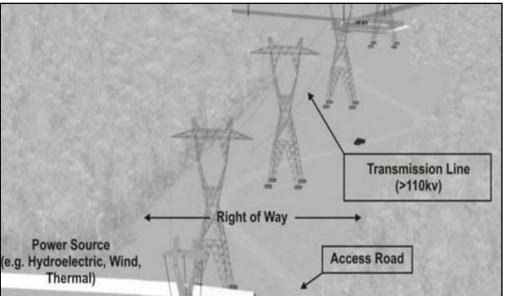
Right of Way and Access Road for OHTL (IFC, 2007)
